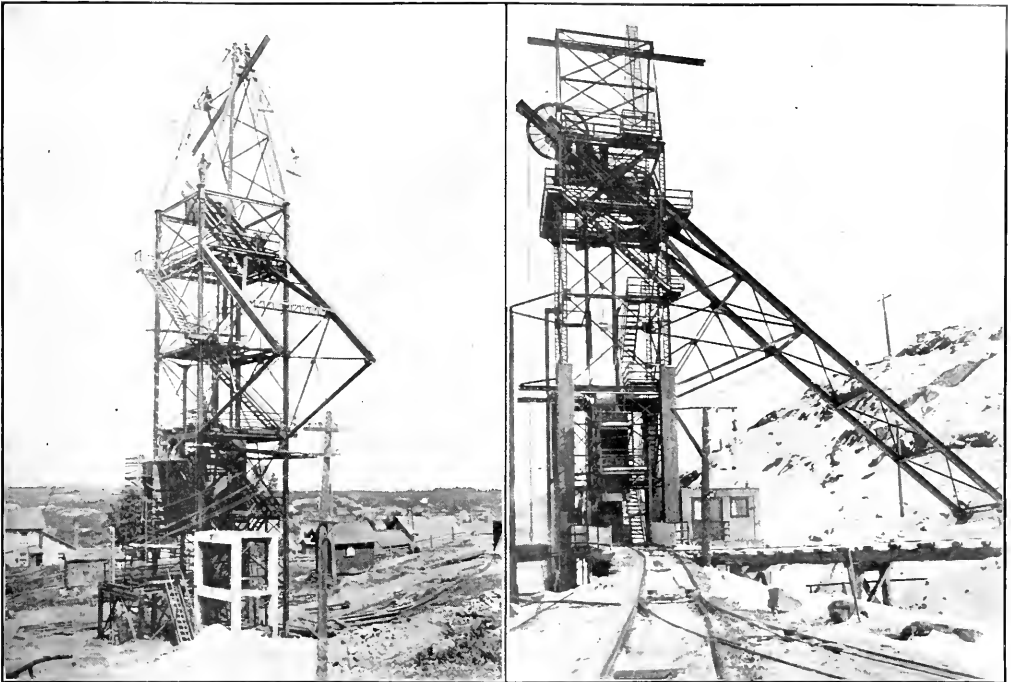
NEW STEEL HEADFRAME DURING CONSTRUCTION AND AFTER COMPLETION
